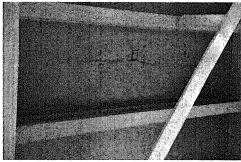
Krung Thep Crack Figure (steel place at the bottom surface of a deck) (Deck)
